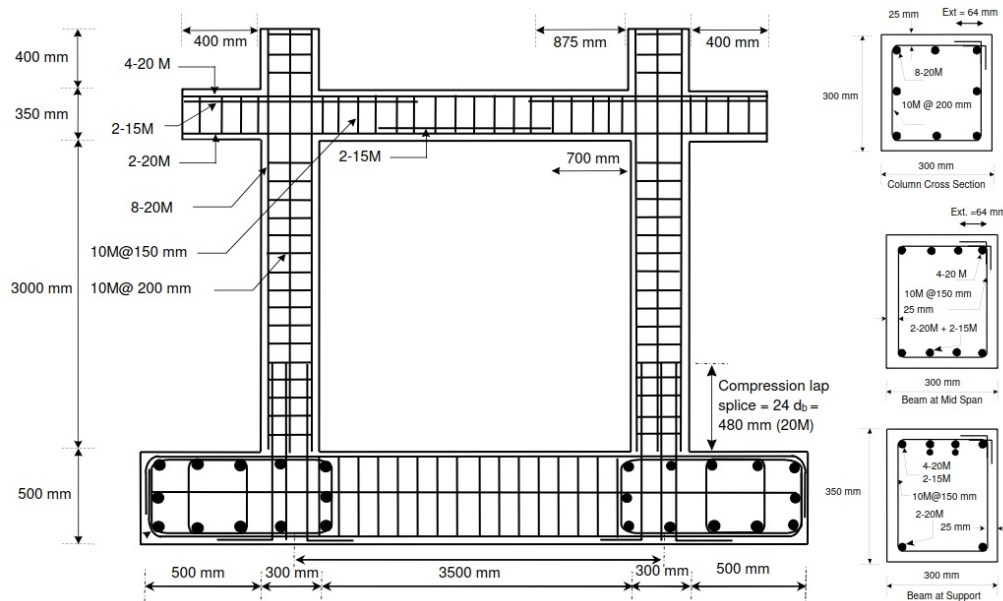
Section and reinforcement detail of the tested frame (Al-Sadoon 2016)
